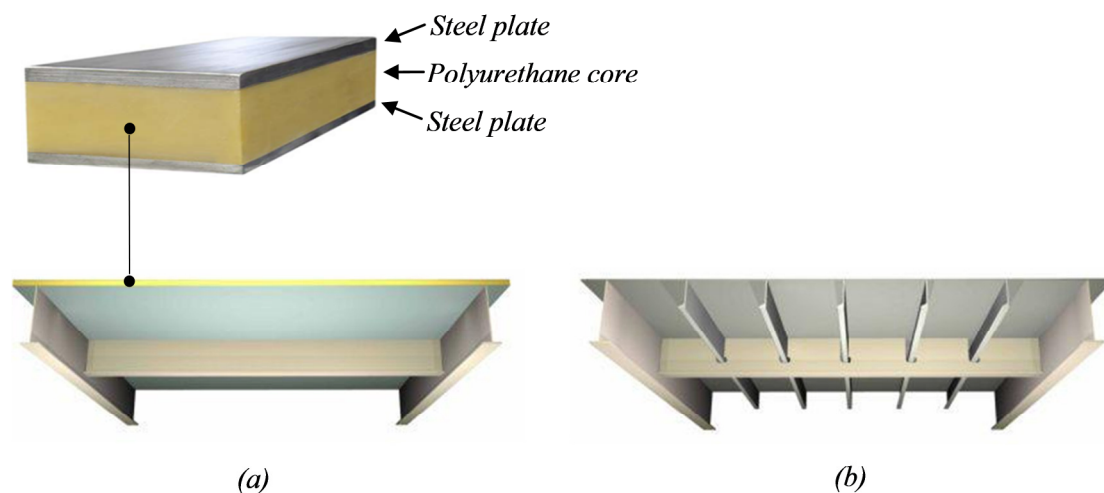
1(a) bridge deck with SPS structure, (b) conventional orthotropic steel deck with longitudinal stiffeners (3)
